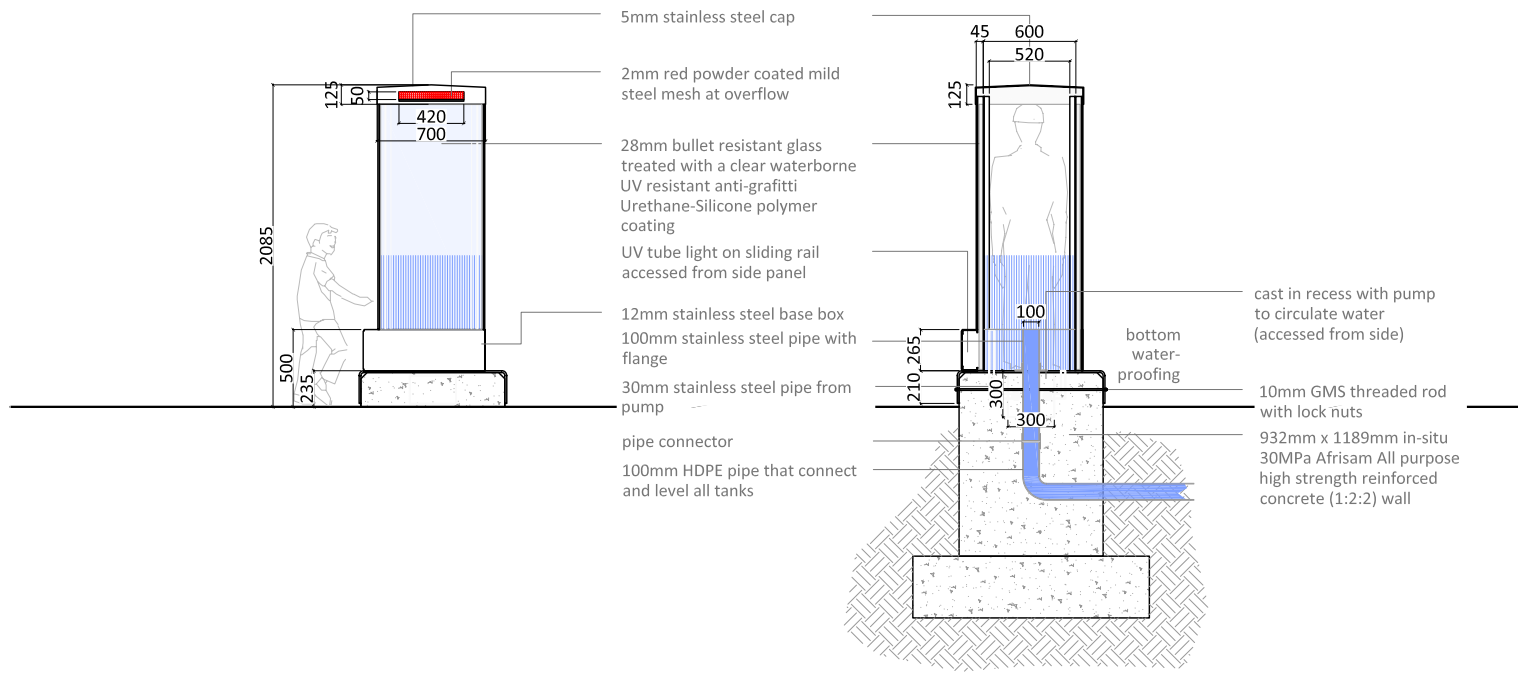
1. RAIN METER DETAIL SECTION AND ELEVATION
